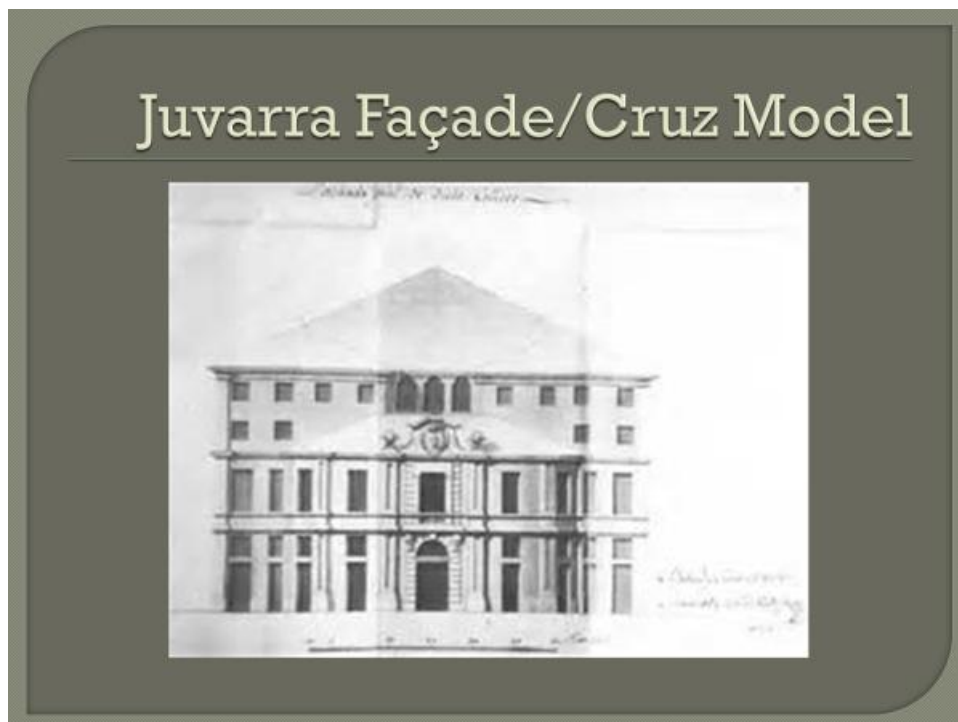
Juarra façade plan from Archivo de Villa (Thomason 16).
